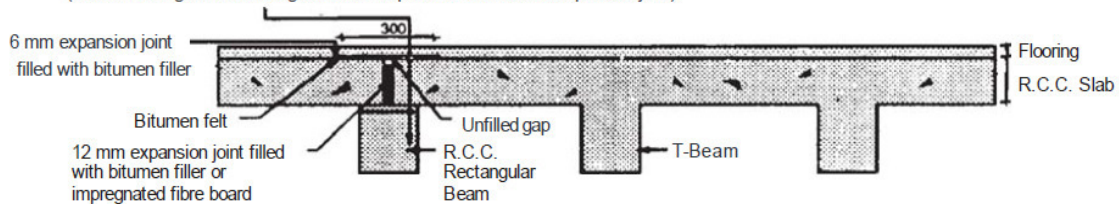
Slab & T-Beam Construction of Long Length
